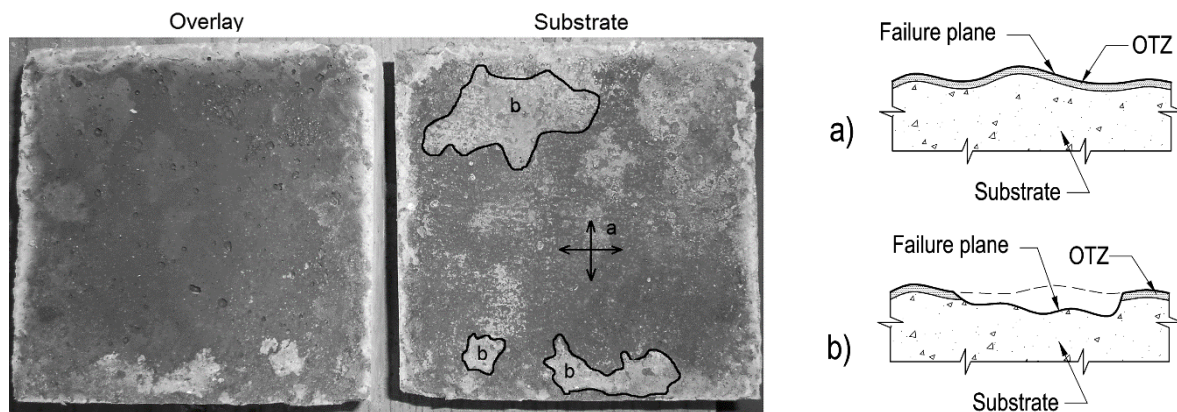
Failure modes detected in the tested specimens type NC-HPC under splitting tension
